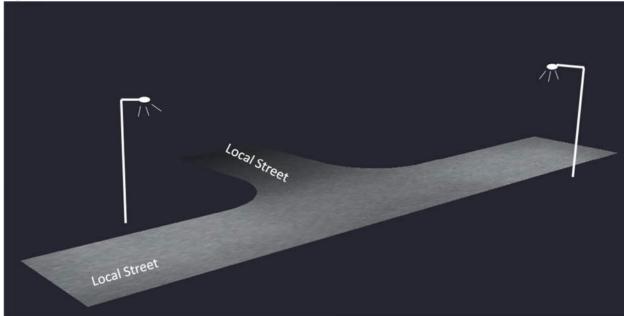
Rendering of T-Intersection: Local Street vs Local Street – Isometric View
